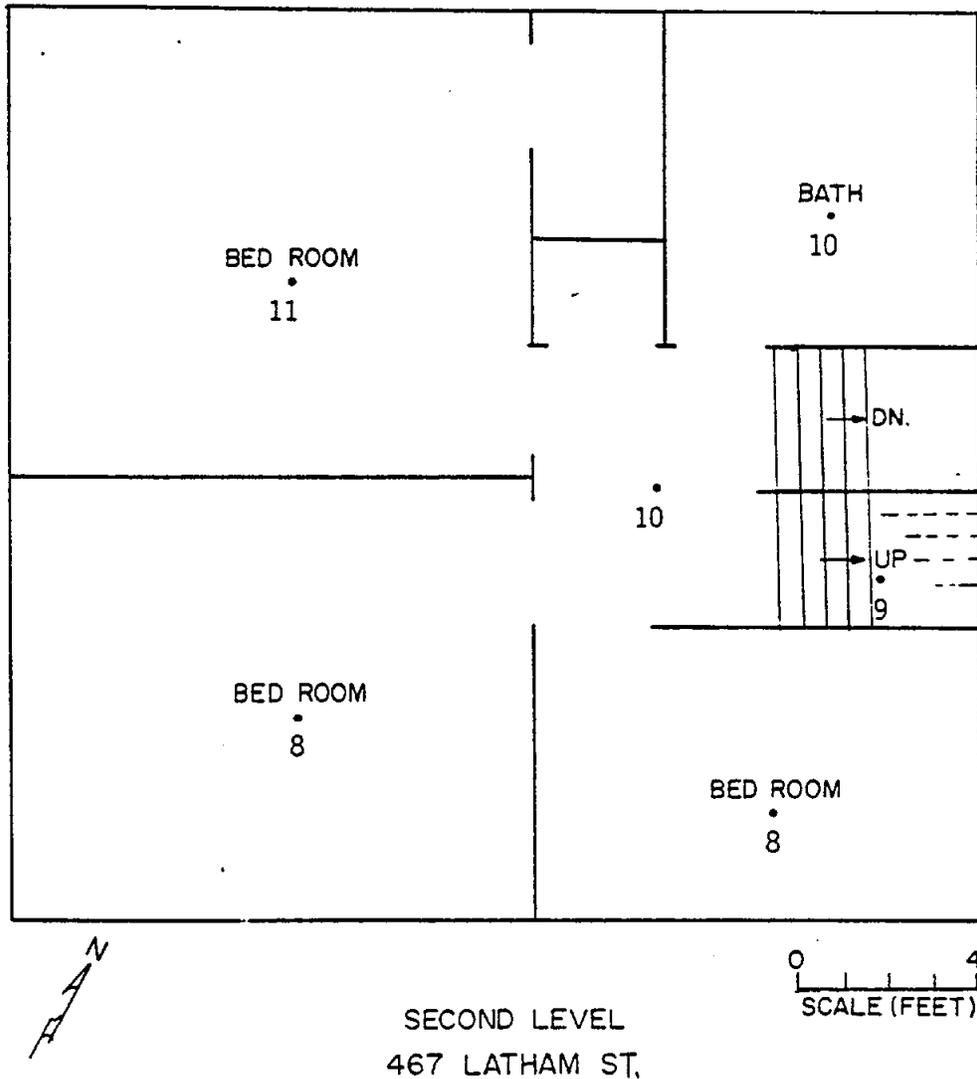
Schematic of the second level floor plan at 467 Latham Street showing external gamma-ray measurement results at 1 m.
